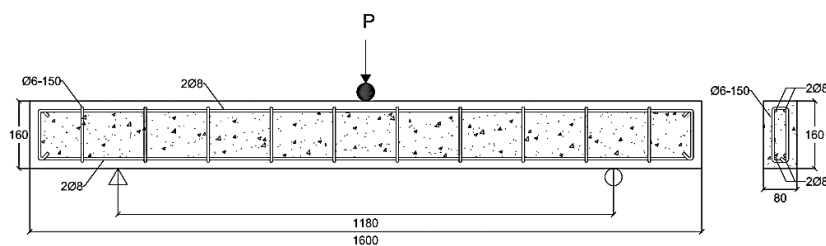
Details ~~The dimensions and reinforcement of RC beams, dimensions and reinforcement~~
